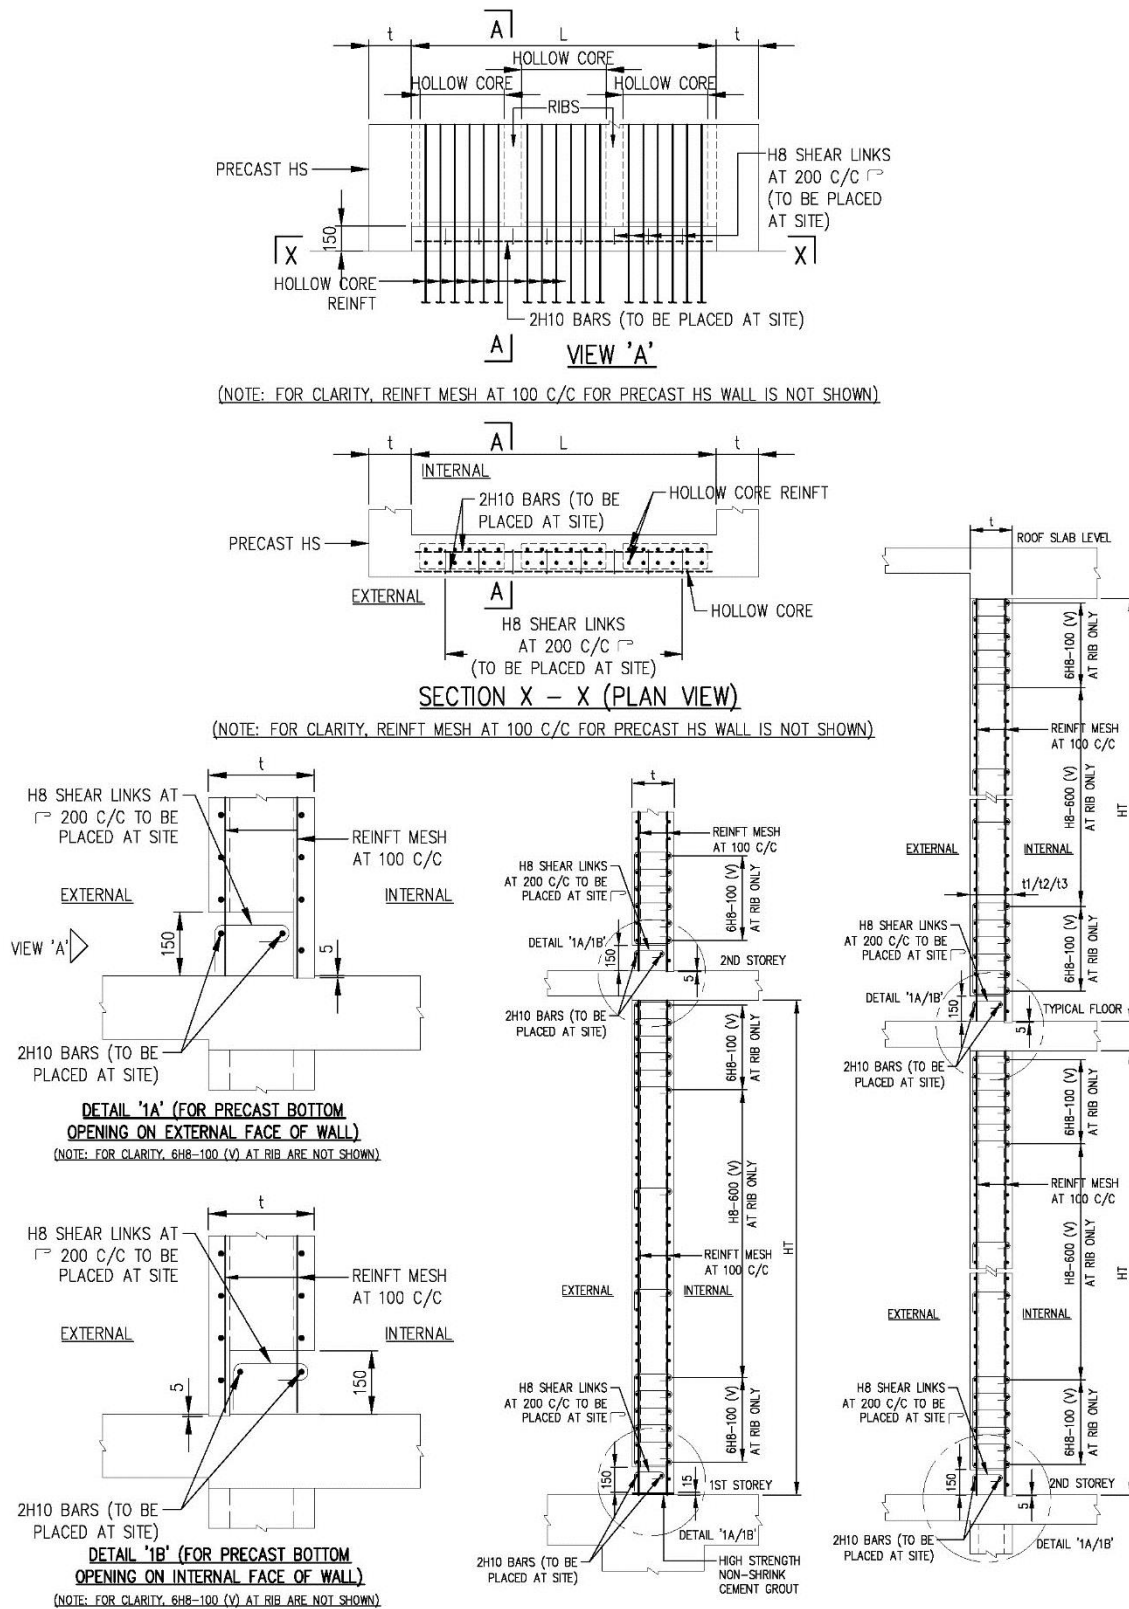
REINFORCEMENT BAR DETAILS OF RIB
